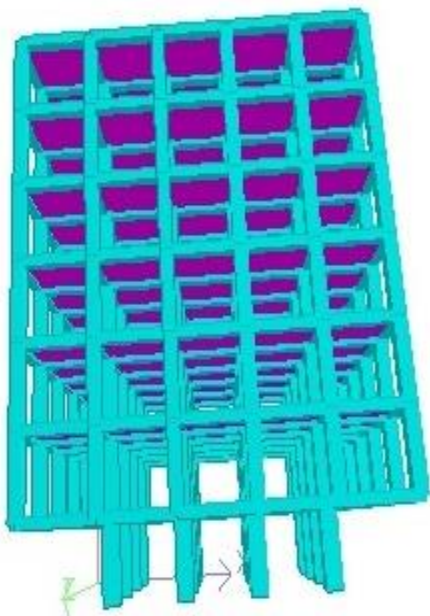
G+6 FRONT VIEW Building model with floating column.
